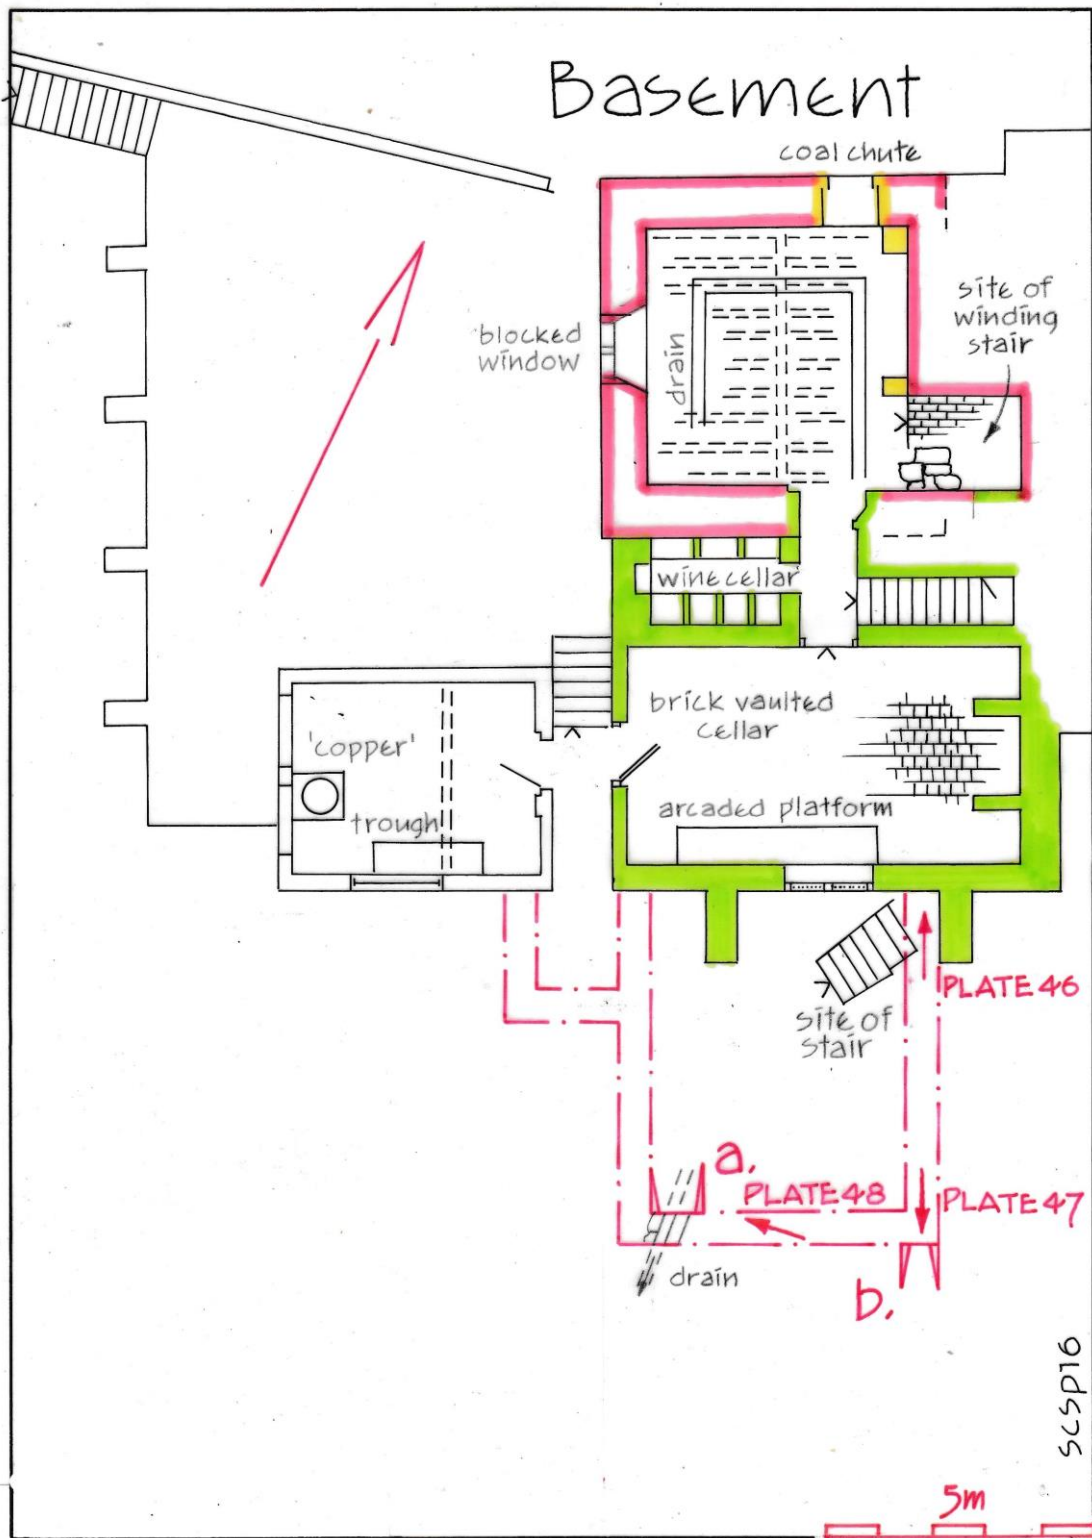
; Basement Plan & the results of the archaeological recording with photographic locations (showing location of foundation trench and drain 104, see Fig. 17 for trench section)
